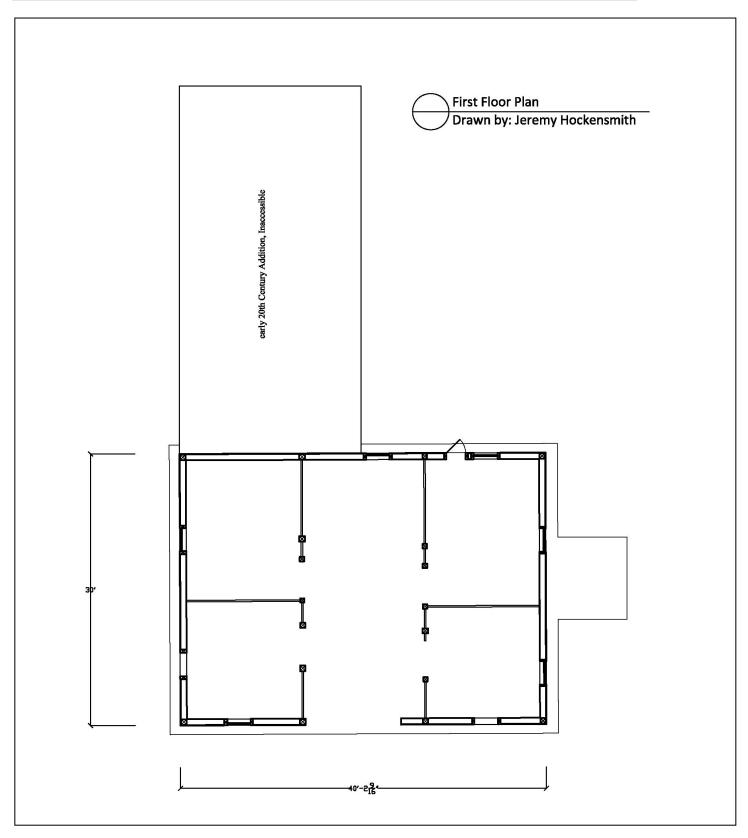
First floor plan of the Houseworth barn. The rear "ell" was a later addition and was at the time of the 2012 documentation inaccessible due to its condition.
